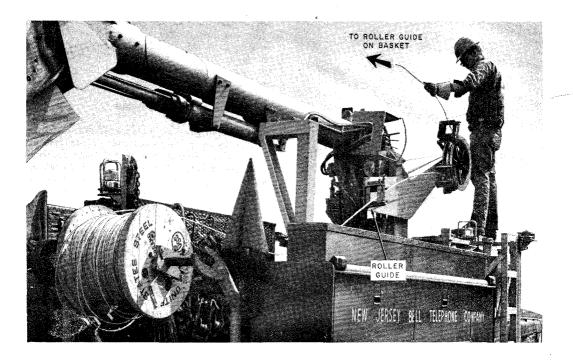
Strand Threaded Through Guides on SKYWORKER
